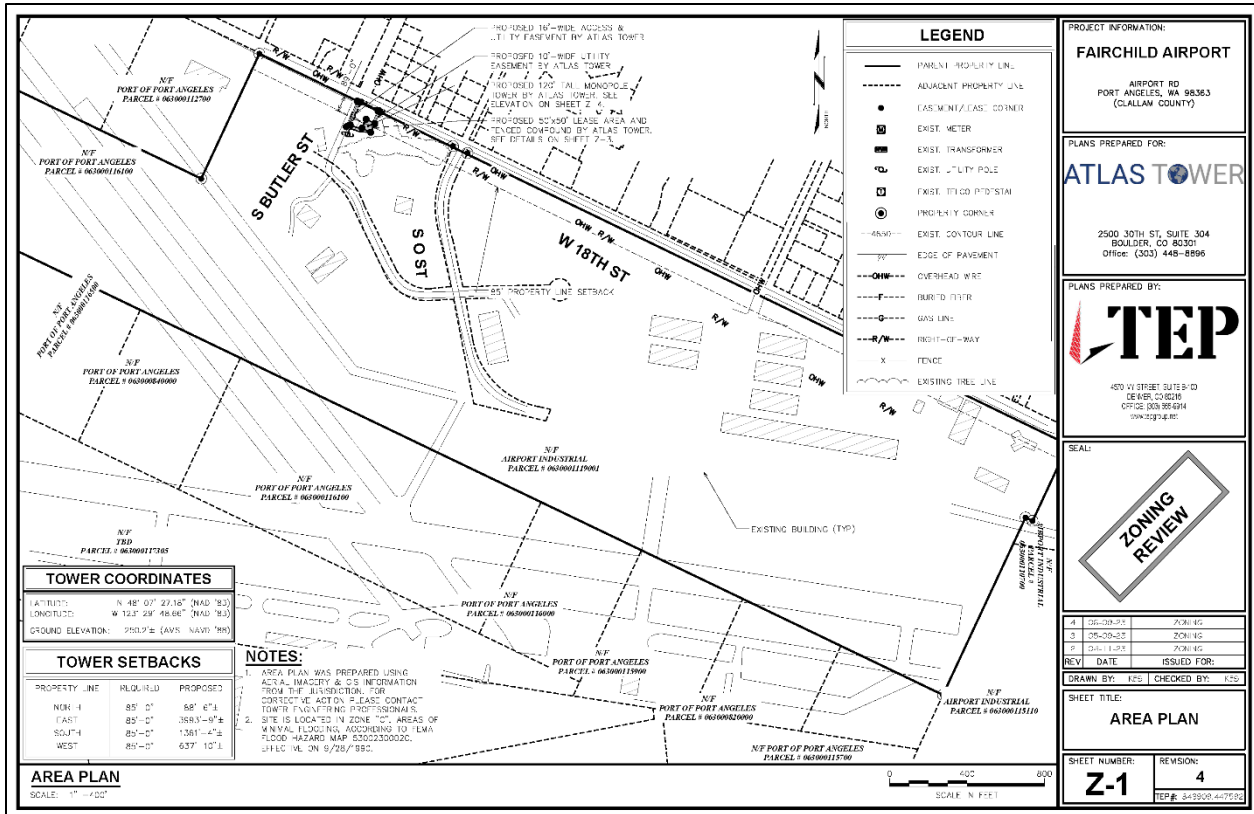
General location of proposed tower on the existing property. For the full preliminary plan set see Exhibit 2.
